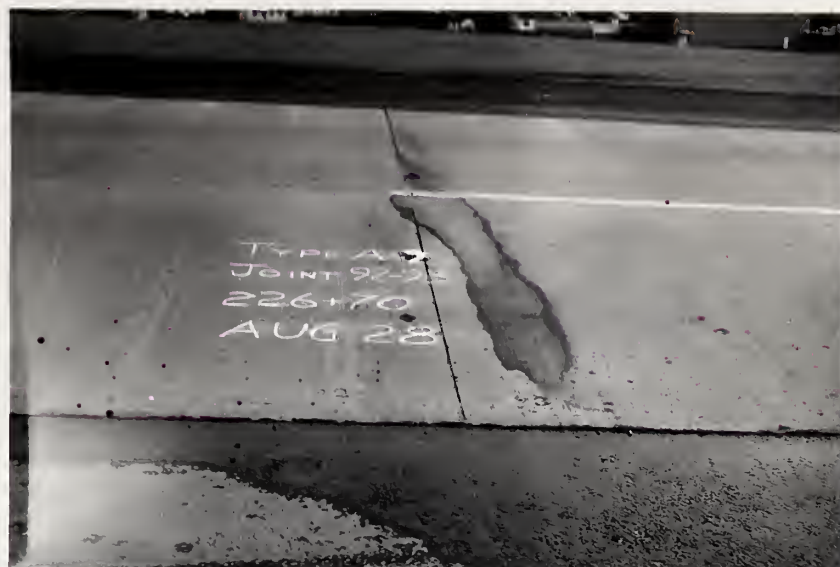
WATER OOZING FROM TRANSVERSE JOINT
